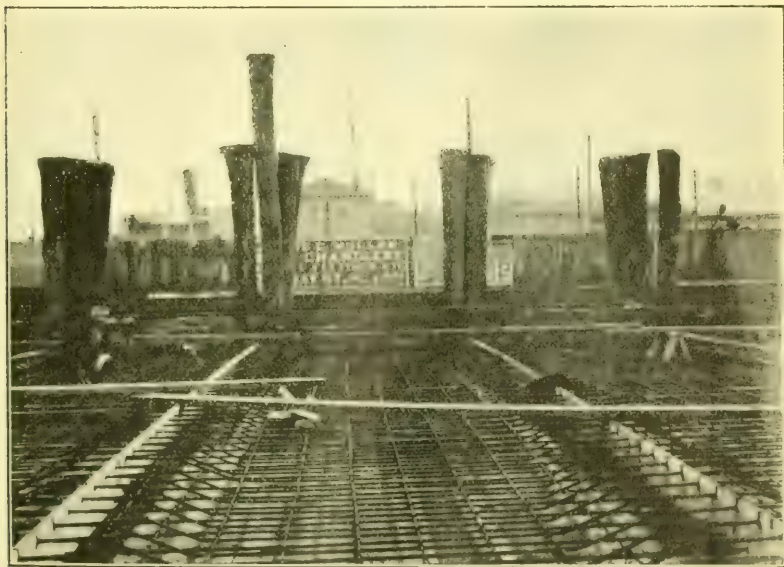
REINFORCEMENT COMPLETE, WITH TEMPLATES WHICH ACT AS FORMS FOR THE ALTERNATE STRIPS OF CONCRETE DECK.
